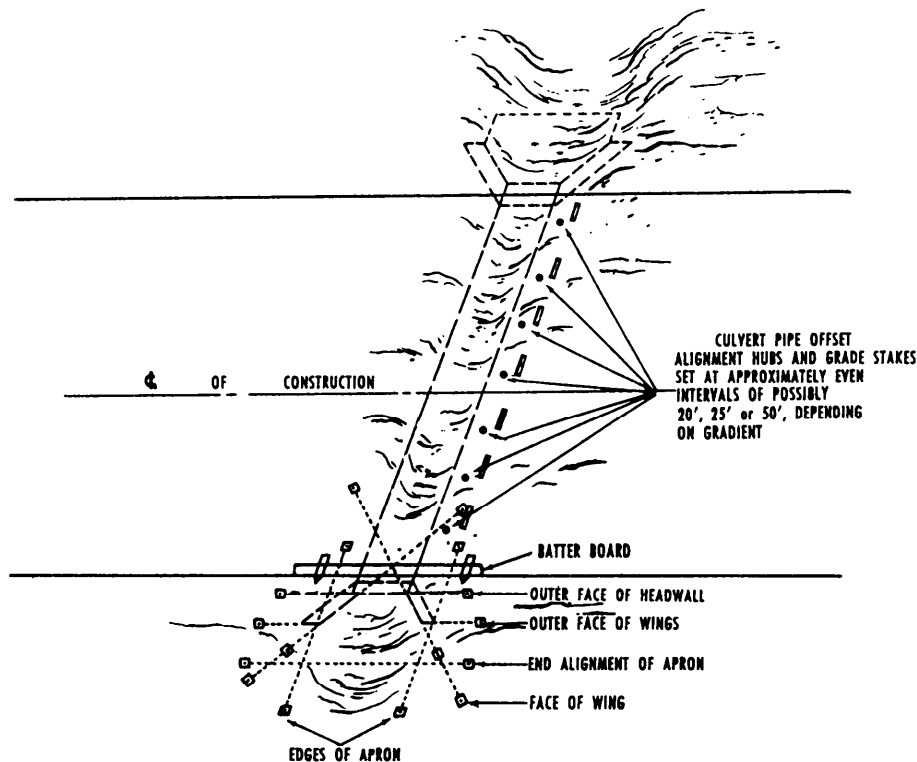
Stakeout of a pipe culvert, wing wall, and apron.
